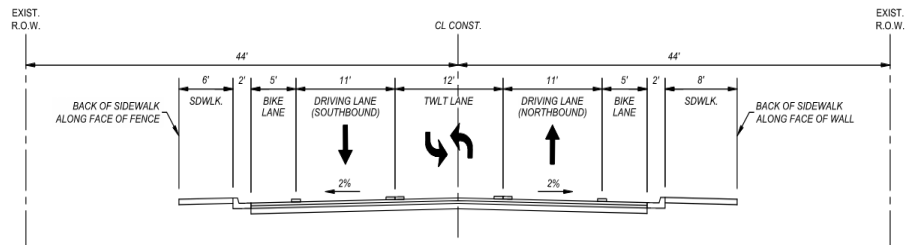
, Proposed Typical Sections from Fire Station Road to Siringo Road – Build Alternative 1
